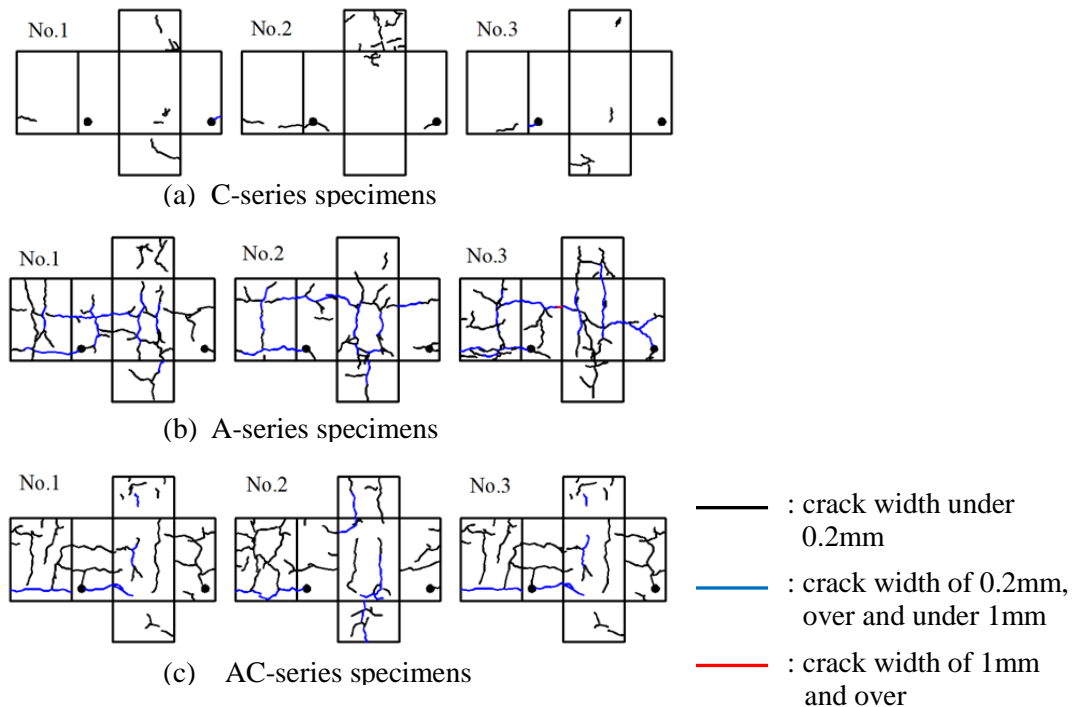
Condition of crack before loading tests (Type-2 specimens)
